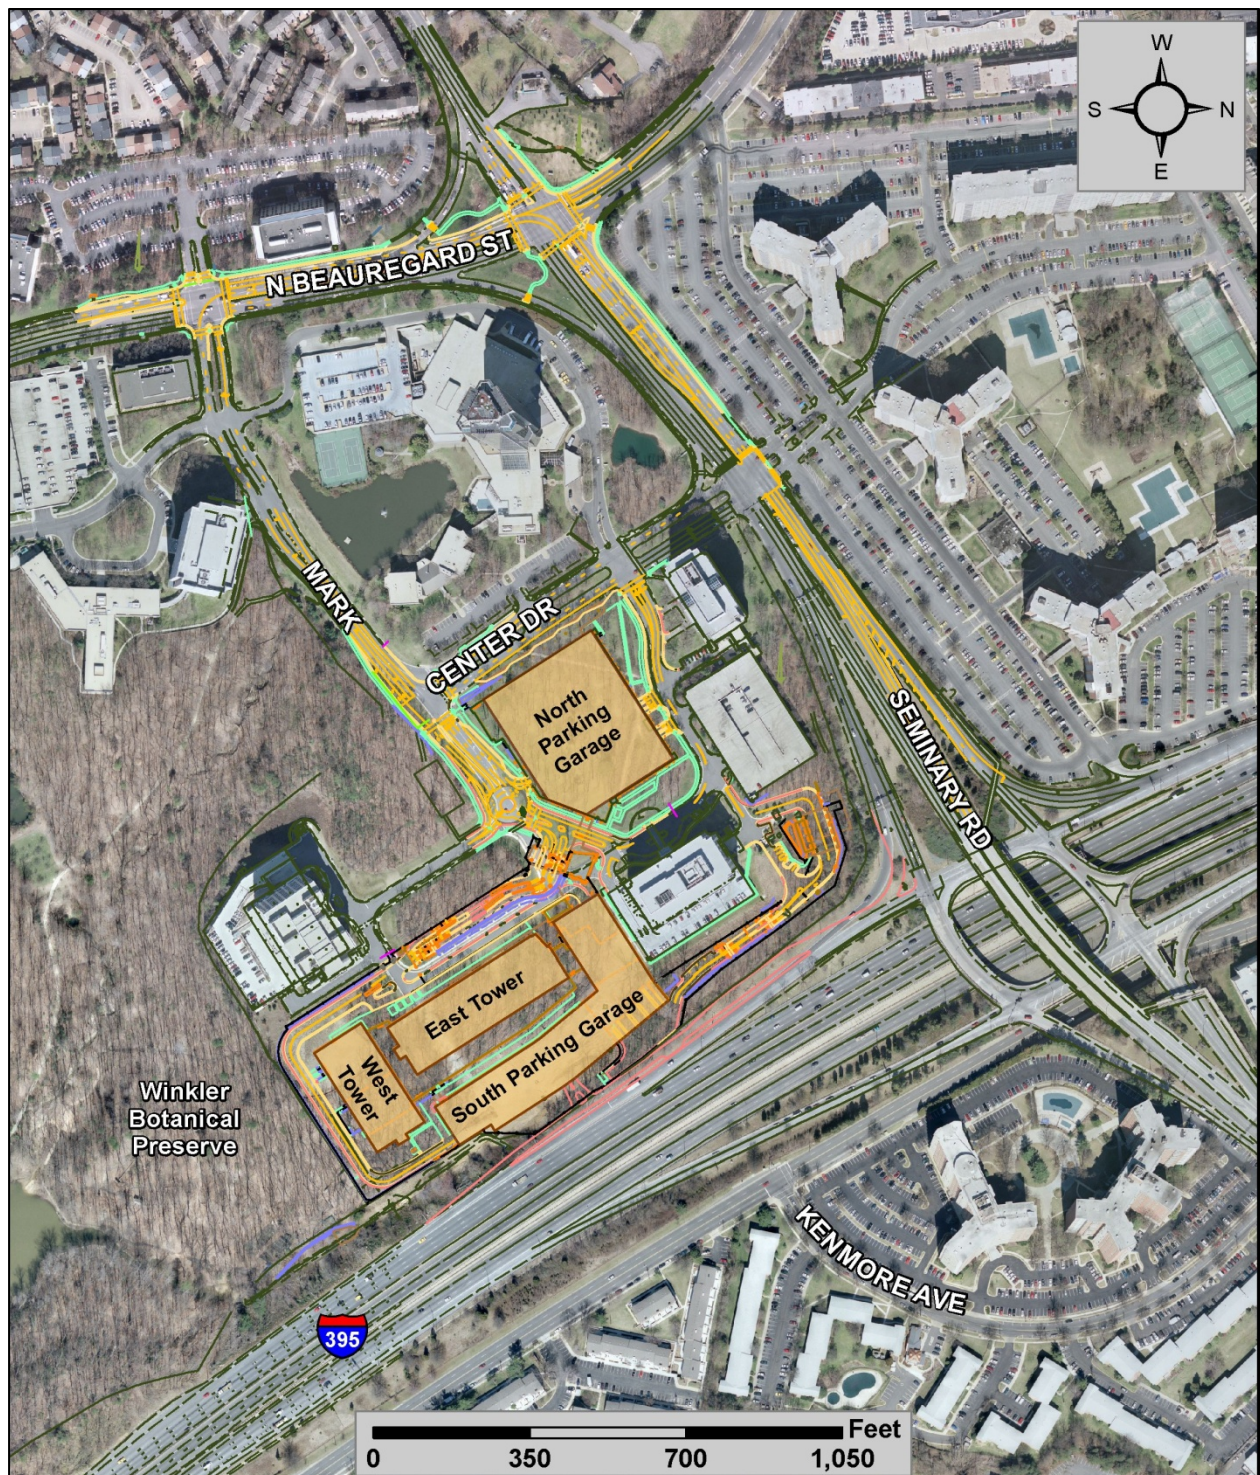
shows an overall site plan highlighting the proposed BRAC 133 development and the adjacent roadway network.
